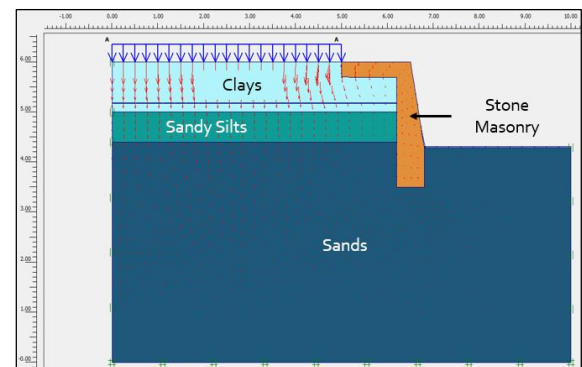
The modeling results of the retaining wall at location 1 RW 26 Cipageran
